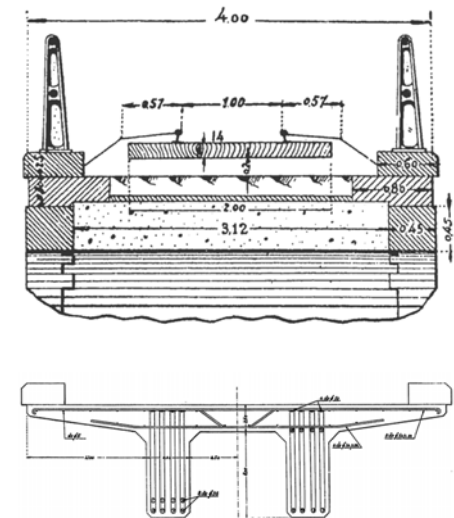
Cross-section of masonry bridges (above). Railing was only necessary in large infrastructures (Mendizábal, 1926)
